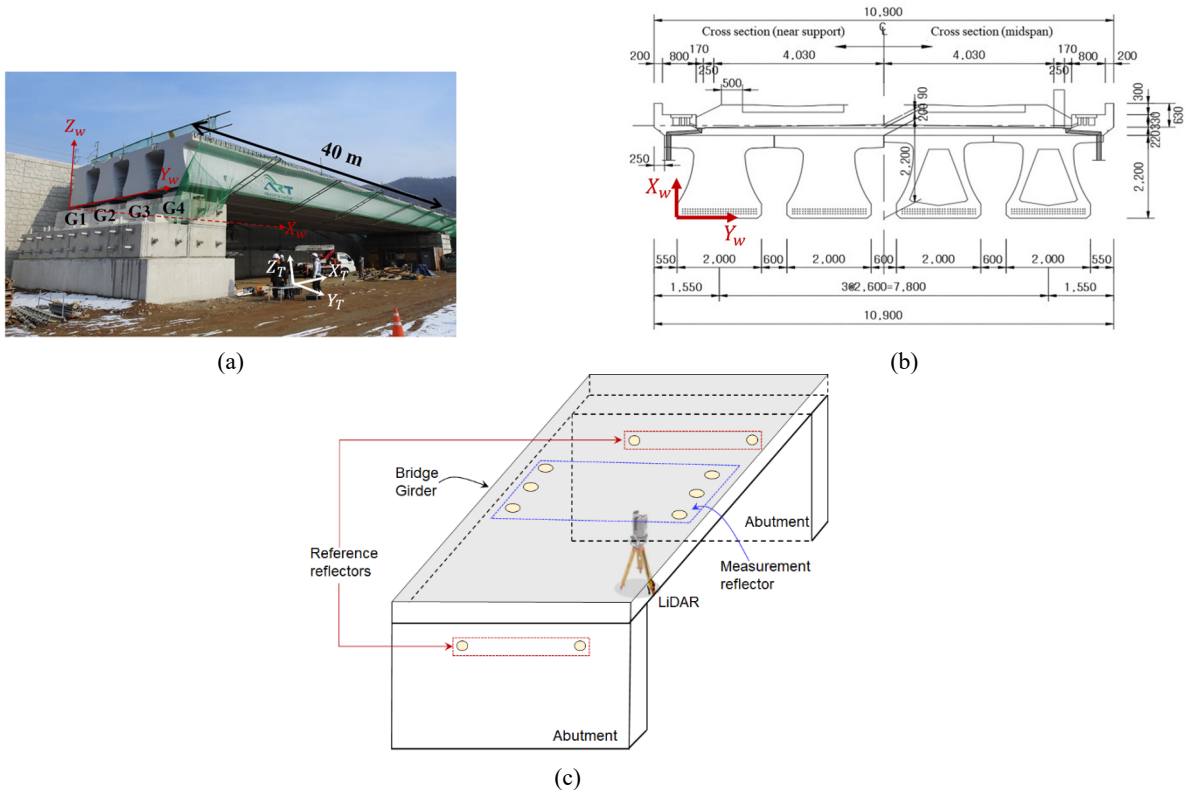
(a) Full-scale concrete railroad bridge during construction phase (Lee *et al.* 2019). (b) Dimensions of bridge girder cross-section; all dimensions are in mm (Lee *et al.* 2019). (c) Schematic showing bridge girder, ‘measurement and reference reflectors’, and location of LiDAR
